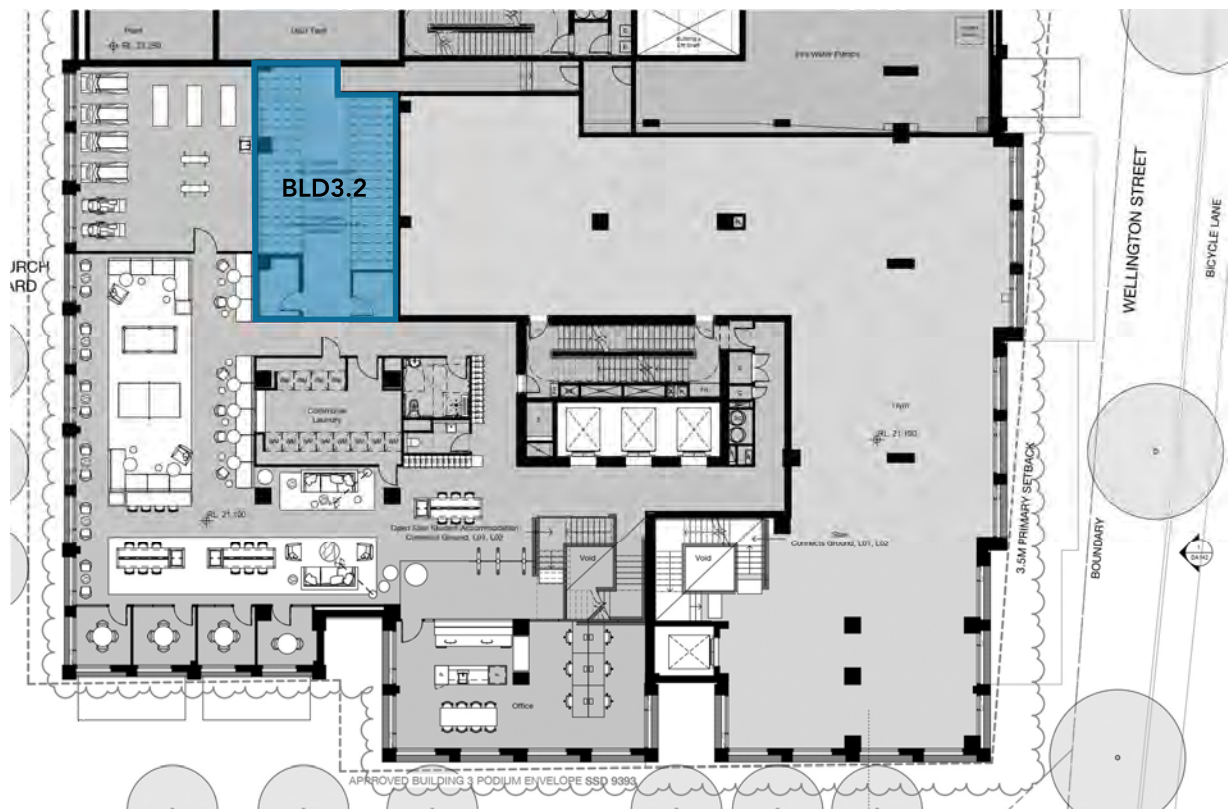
Building 3 General Arrangement Plan – Level 1, Rev K (Source: Bates Smart)
